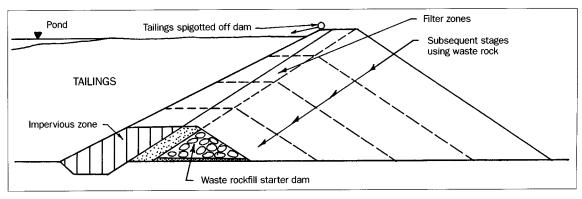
Downstream construction using waste rock (after Klohn, 1980).
